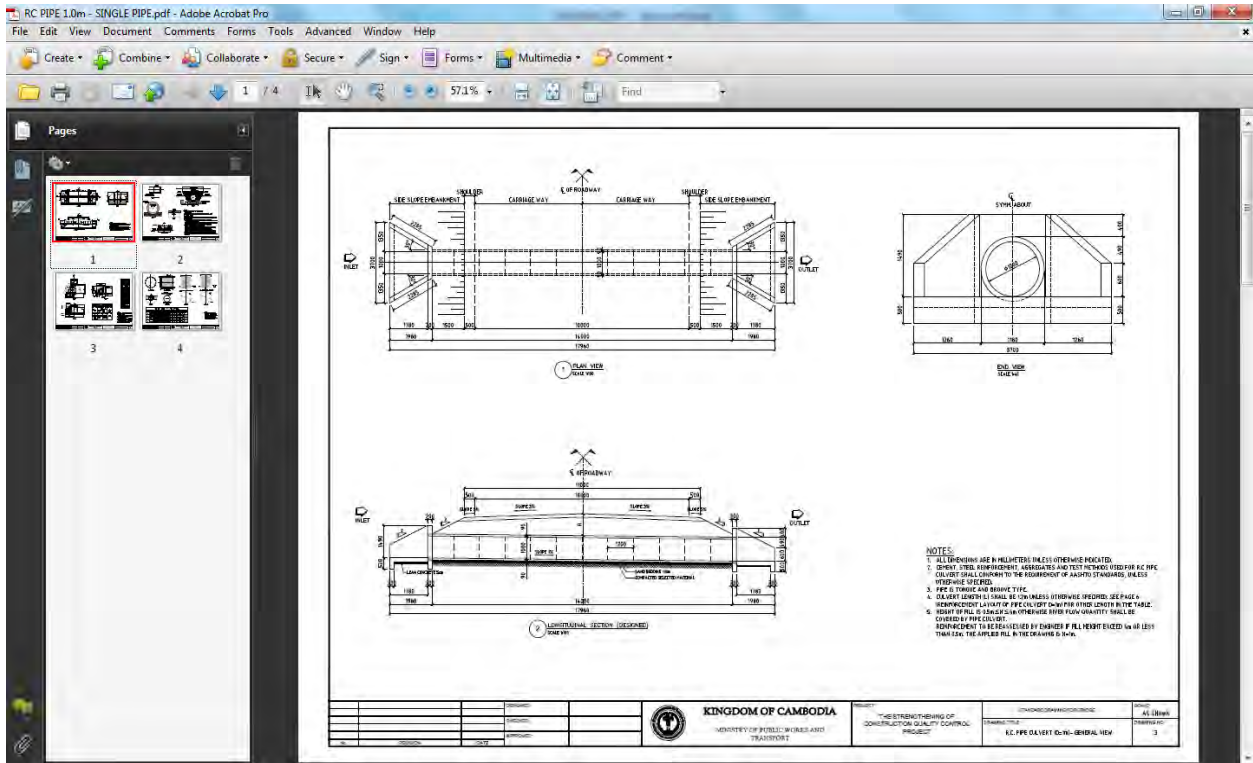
Pipe culvert/D=1.0m/Single pipe/Drawing
